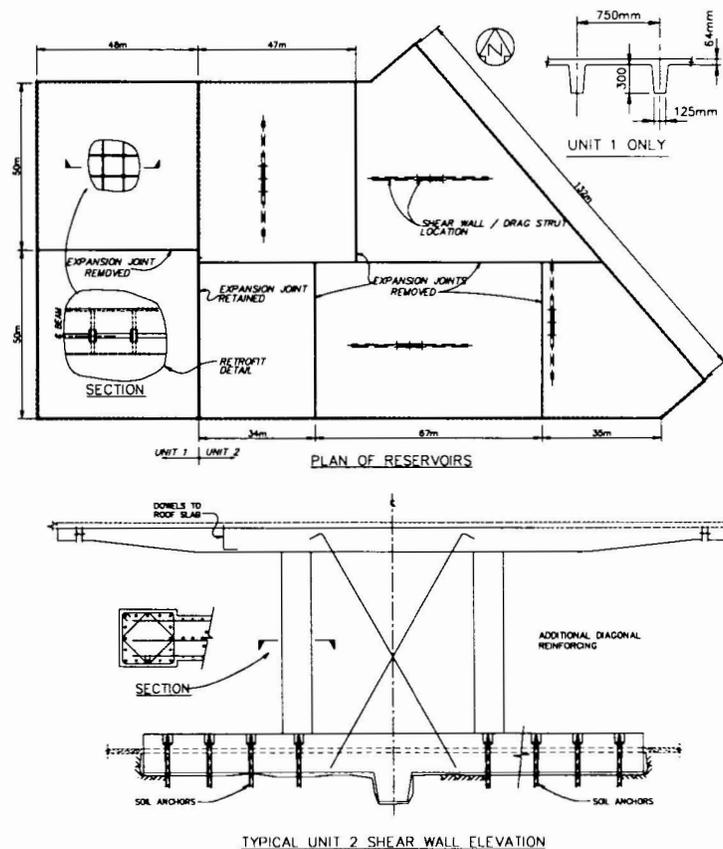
Kersland reservoir plan and shear wall elevation, including typical details.
